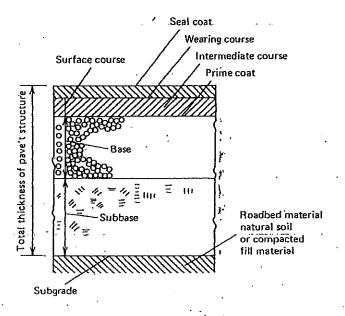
Typical flexible pavement cross section. (Courtesy Transportation Research Board.)
